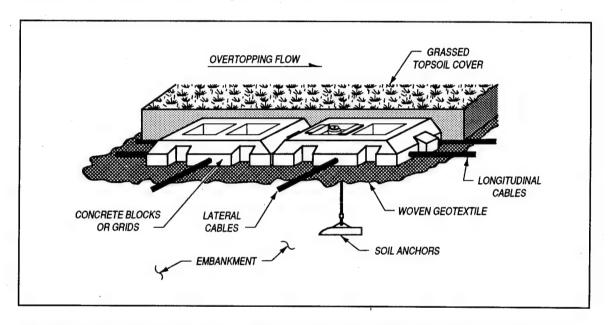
Schematic cutaway of cellular concrete mat system, Blue Ridge Parkway Dams (from Wooten et al. 1993)
